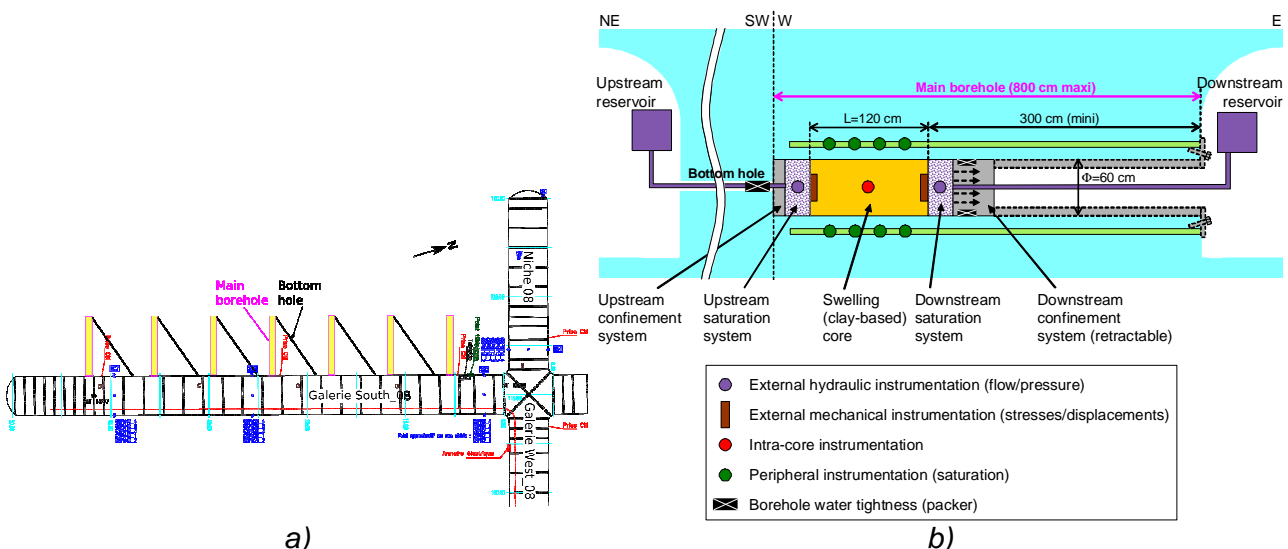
Detail of the SEALEX tests: planned position of the main boreholes and bottom boreholes (dimensions in meters); b) Generic layout (exploded view)
